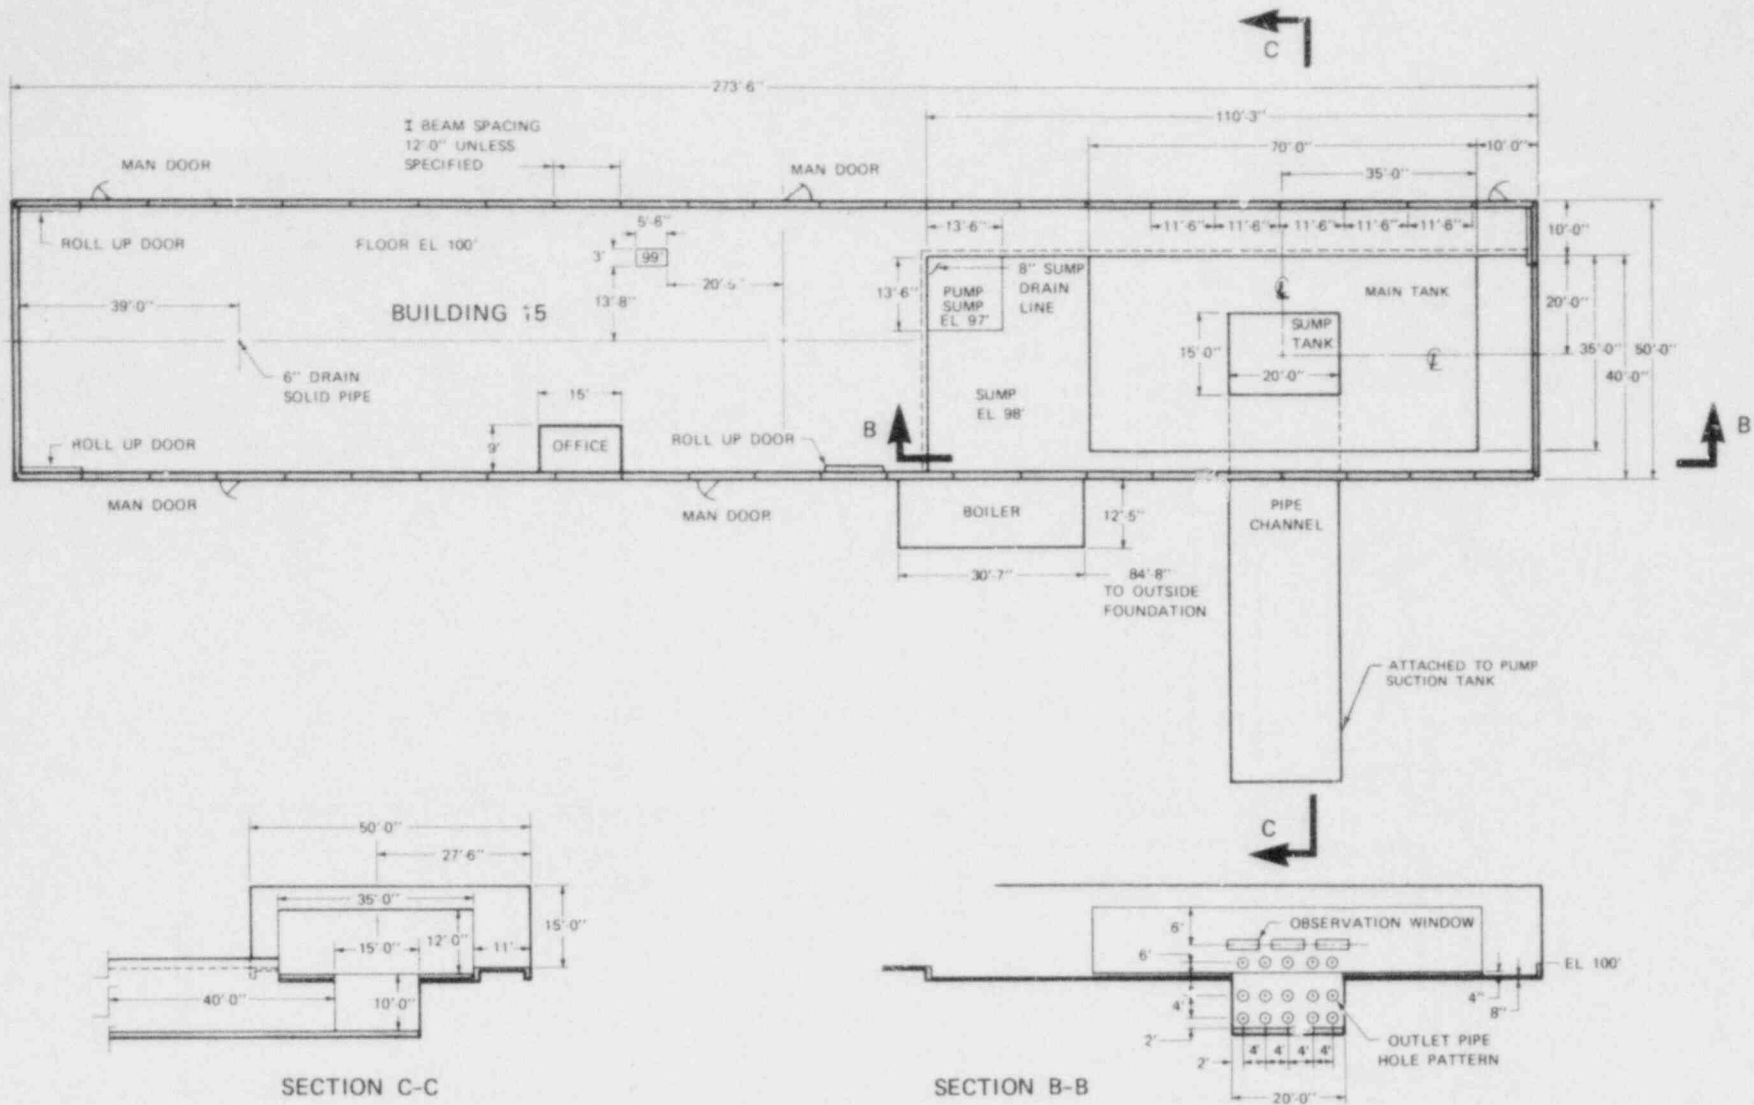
General Layout of the Test Facility Building Showing the Sump and Main Tank Placement
